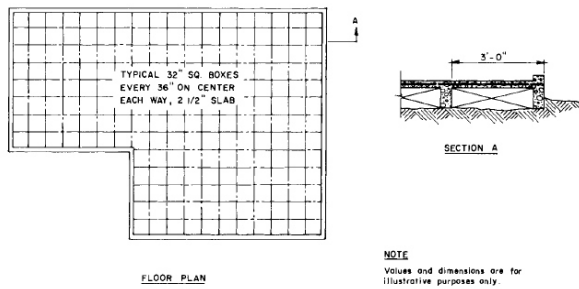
Raised concrete floor system (Huan Chen F., 1975).
